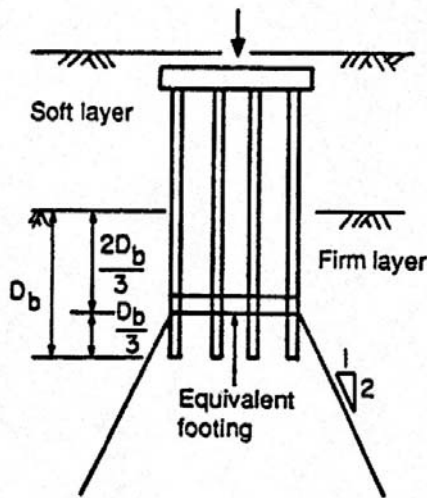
Location of Equivalent Footing (after Duncan and Buchignani, 1976).
